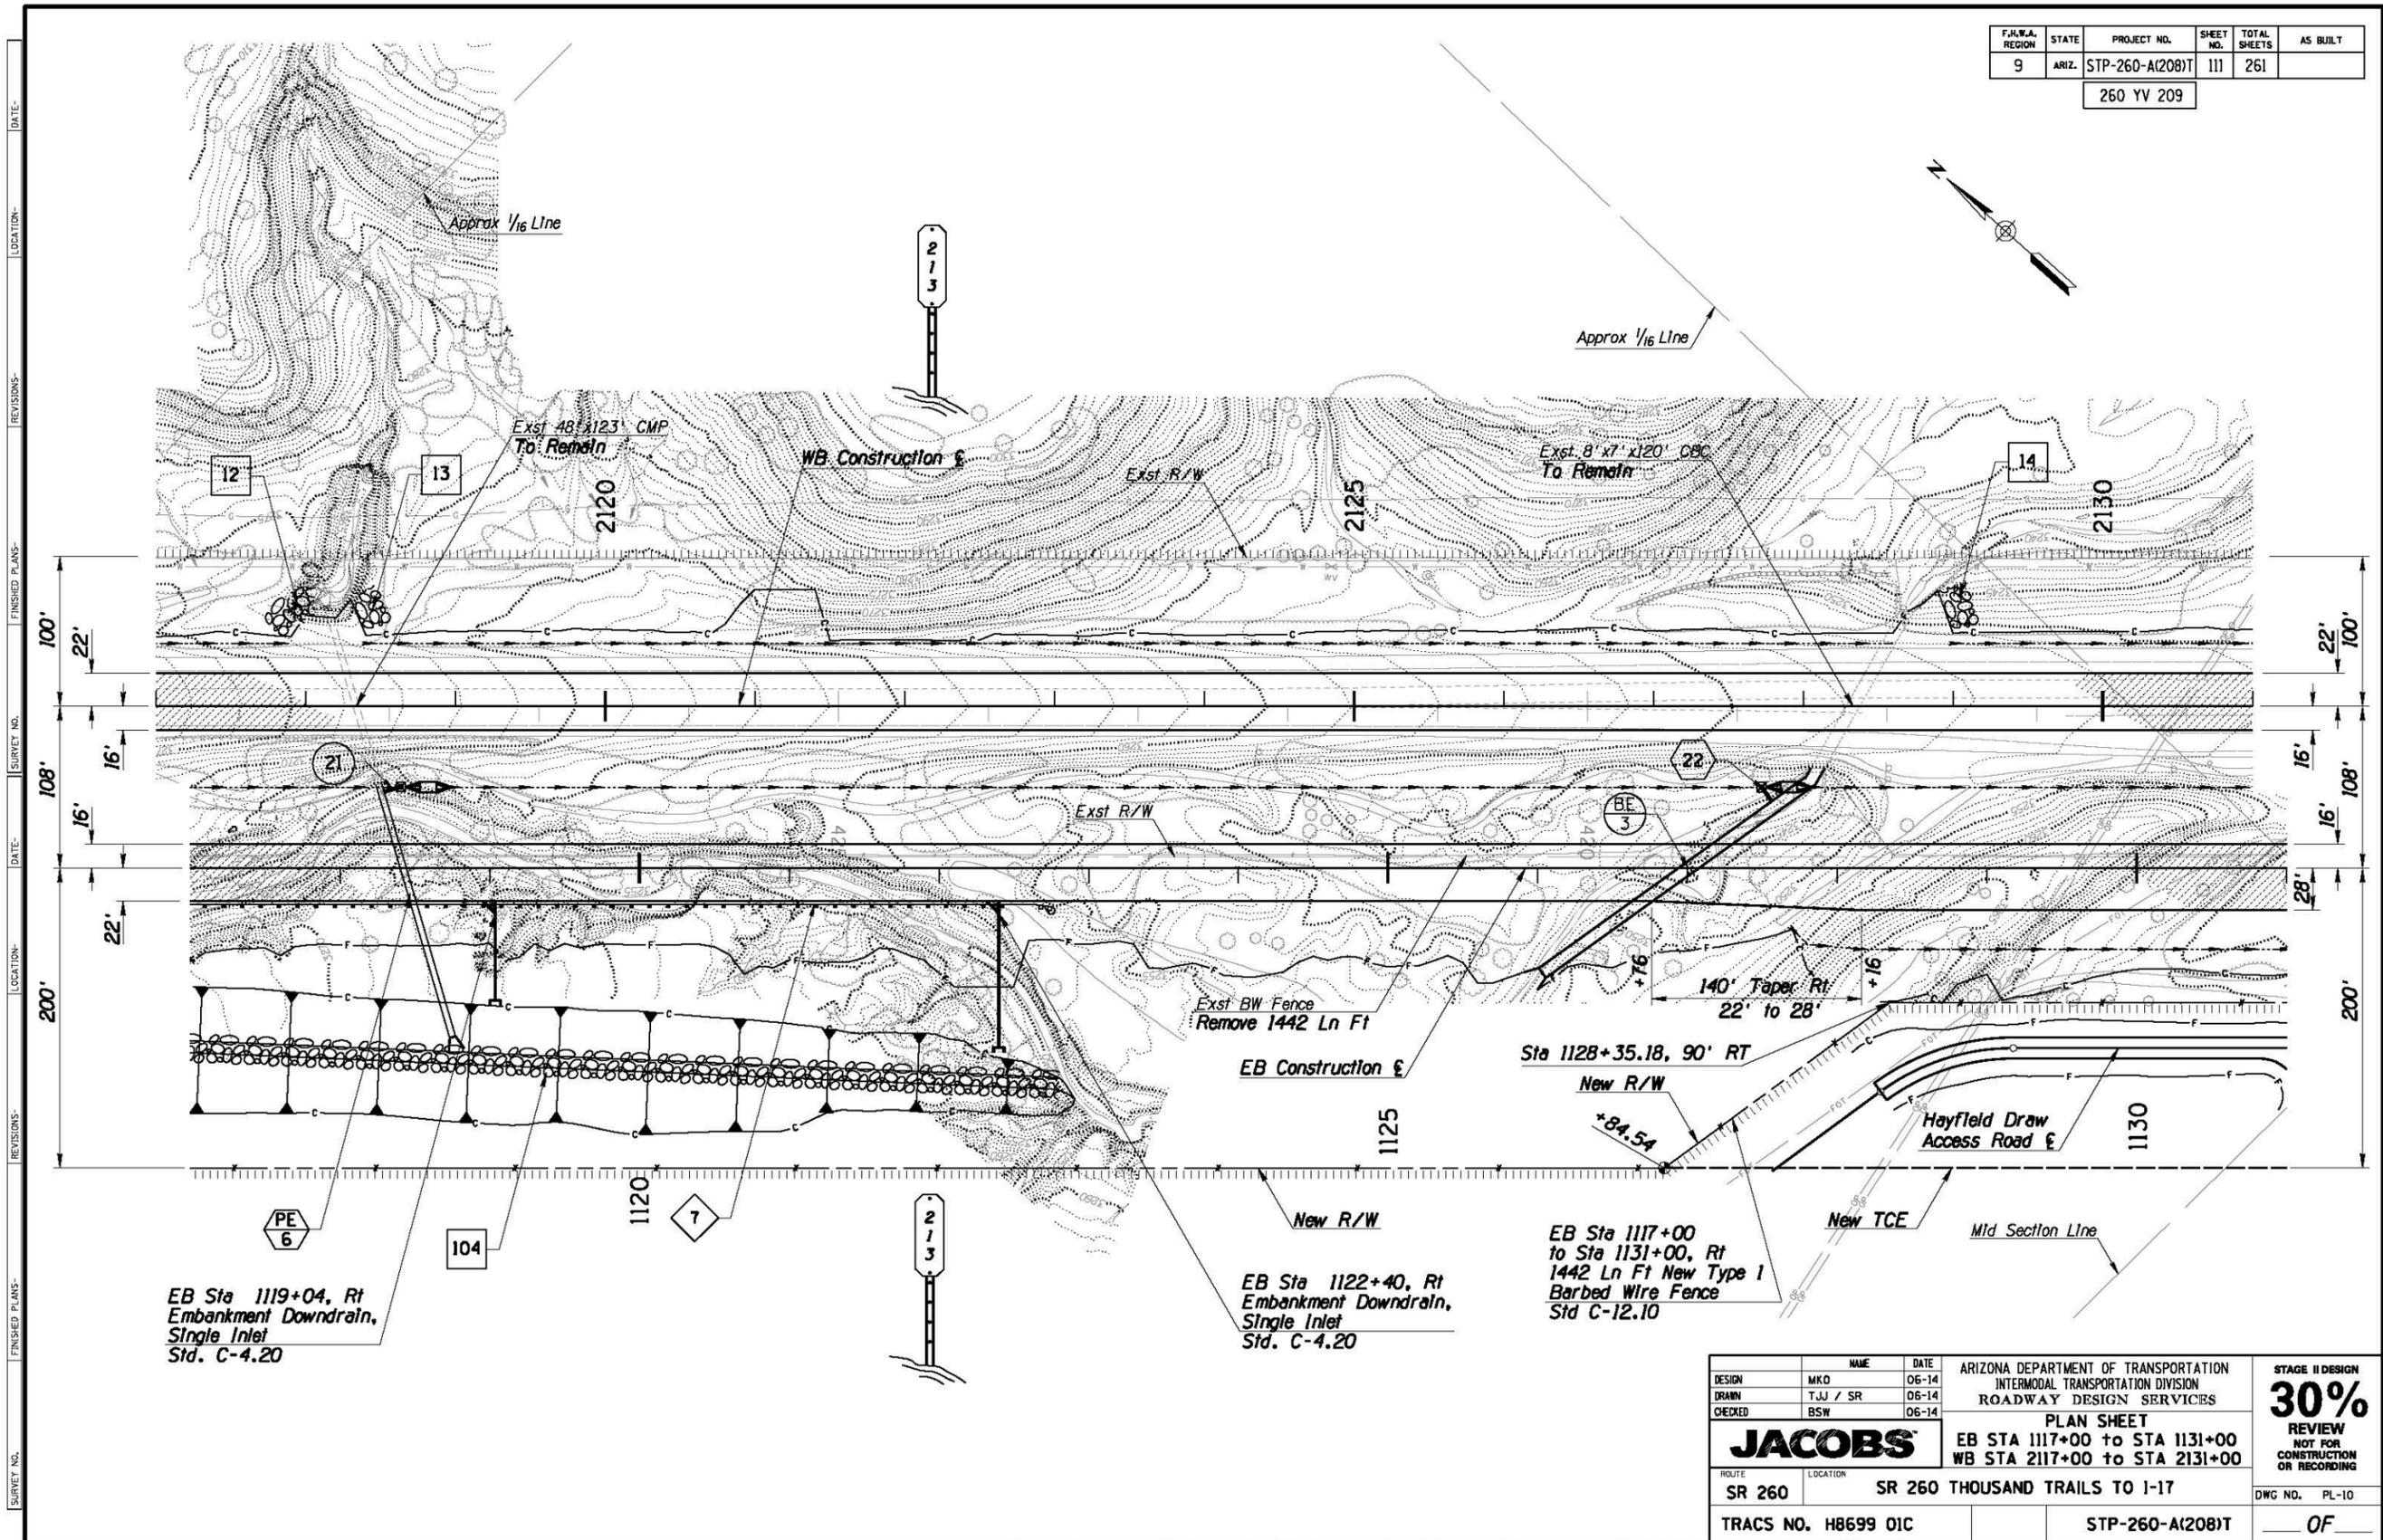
Construction within Wash No. 1 (Preferred Alternative)
